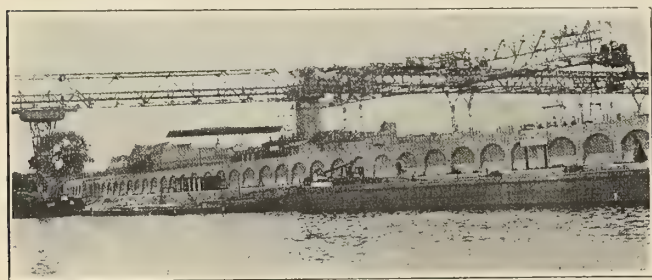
Unloading Plant at Storage Yard, Berlin, Germany
